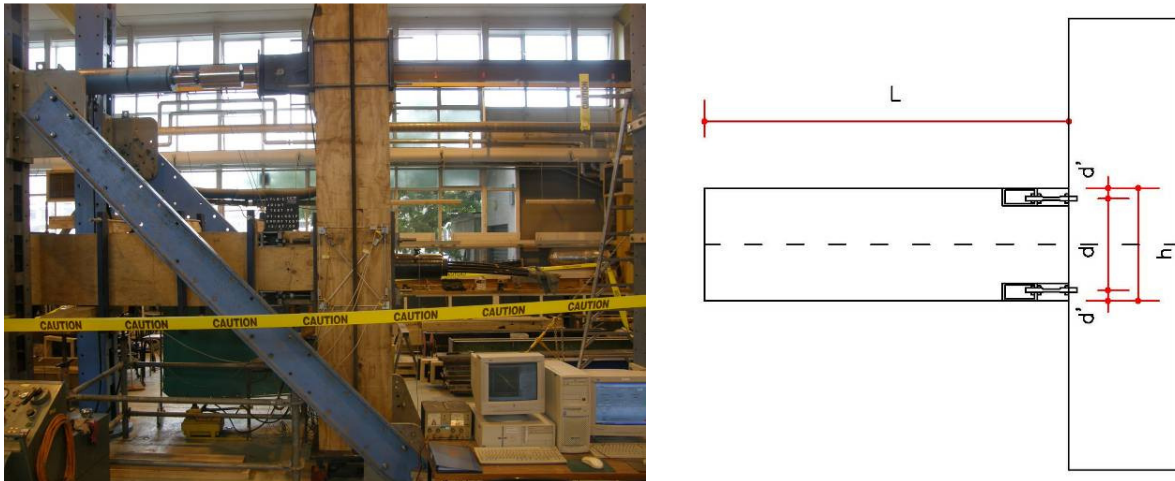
View of Hybrid beam-column joint a) test specimen b) with dimensions
